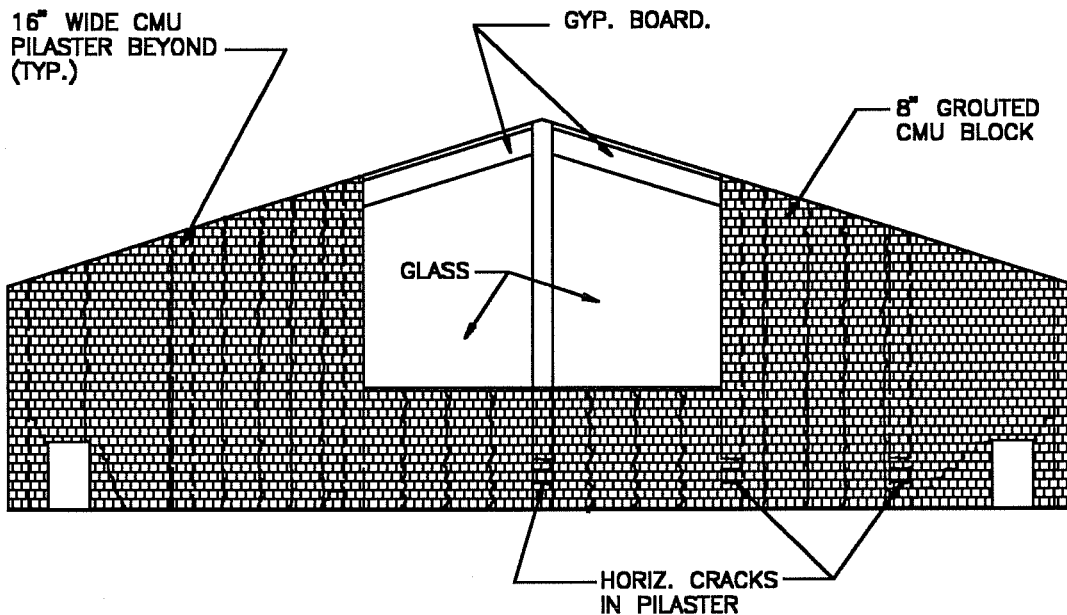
Loma Prieta Community Center - Observed cracks in south gymnasium wall
